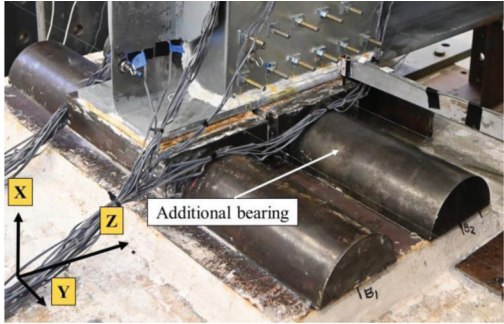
Specimen 7: web crippling deformations behind the concrete panel.
